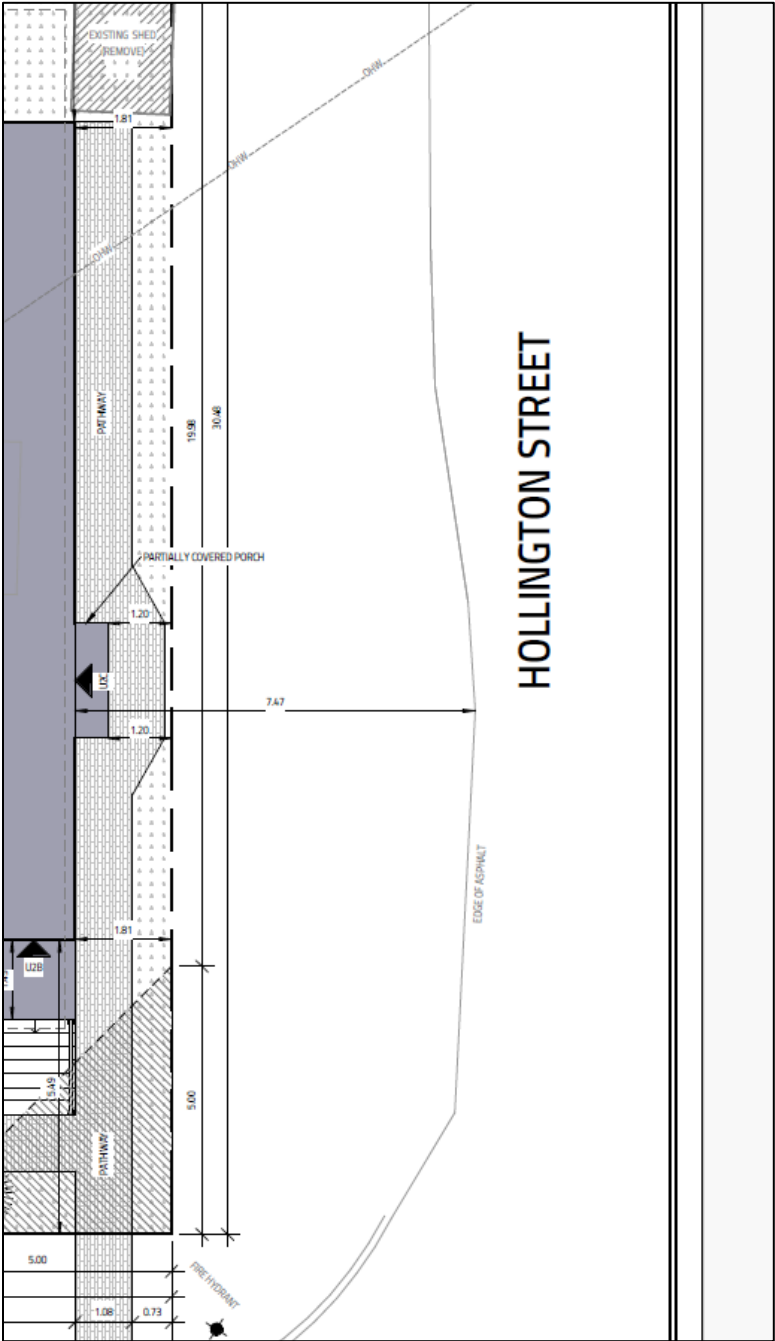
Corner side yard along Hollington illustrating ample space from proposed building to edge of asphalt
